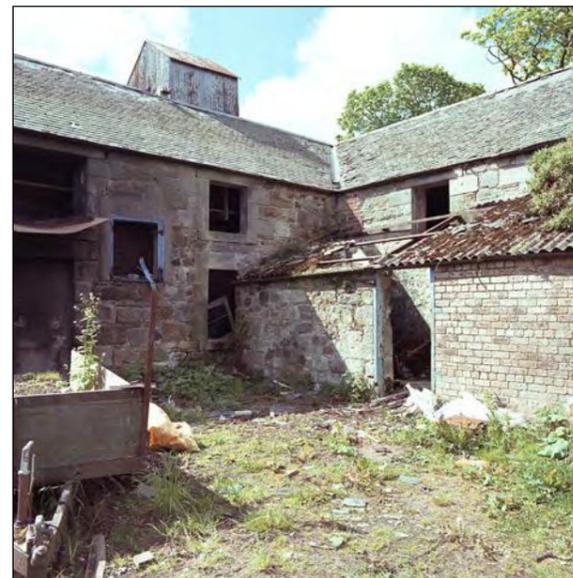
Range A, North elevation, and Range B east elevation with lean-to building.
